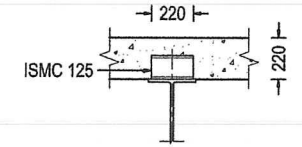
SHEAR CONNECTORS ALONG MID CROSS GIRDER
